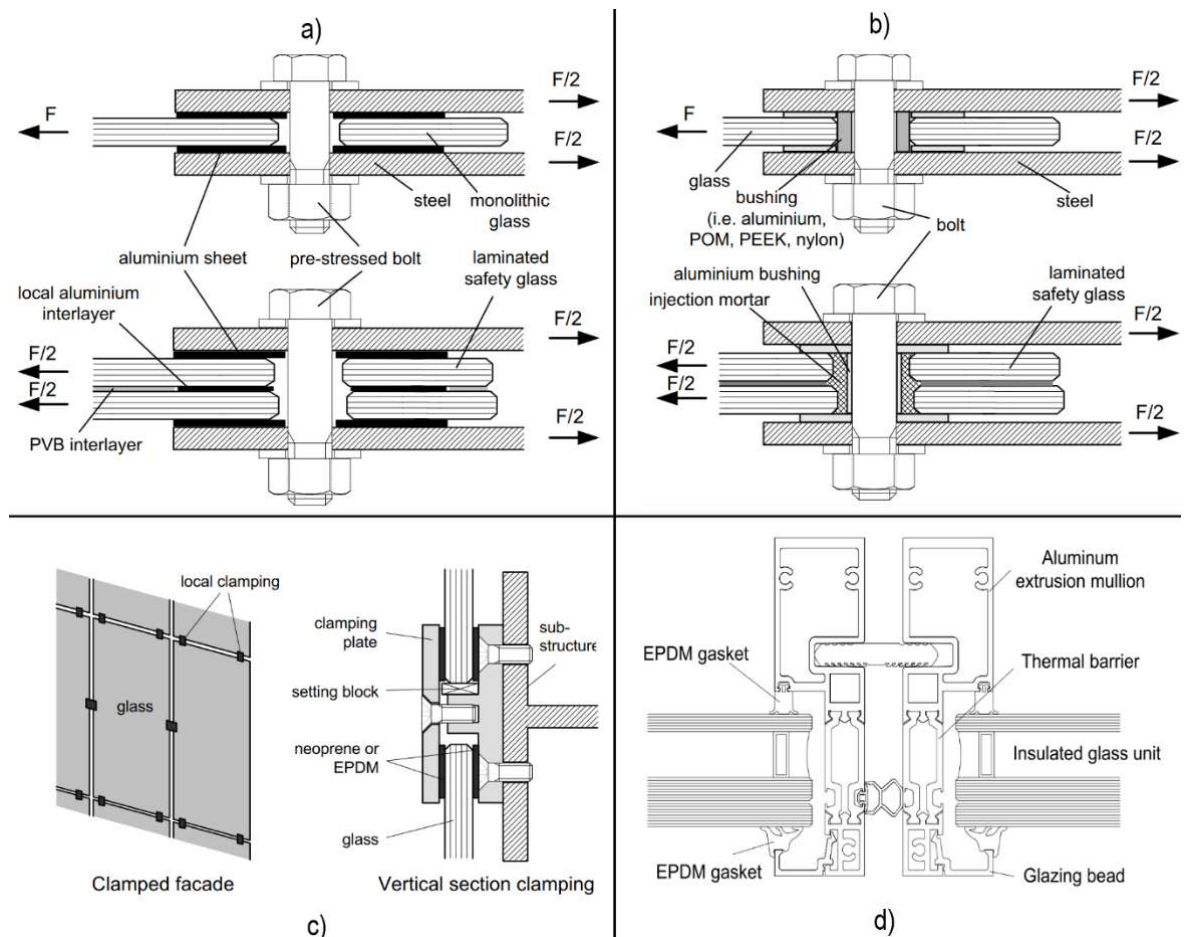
Principal sketches of different mechanical connections: a) friction-grip clamp; b) through bolt; c) low friction clamp (local); d) low friction clamp (linear) [17].
